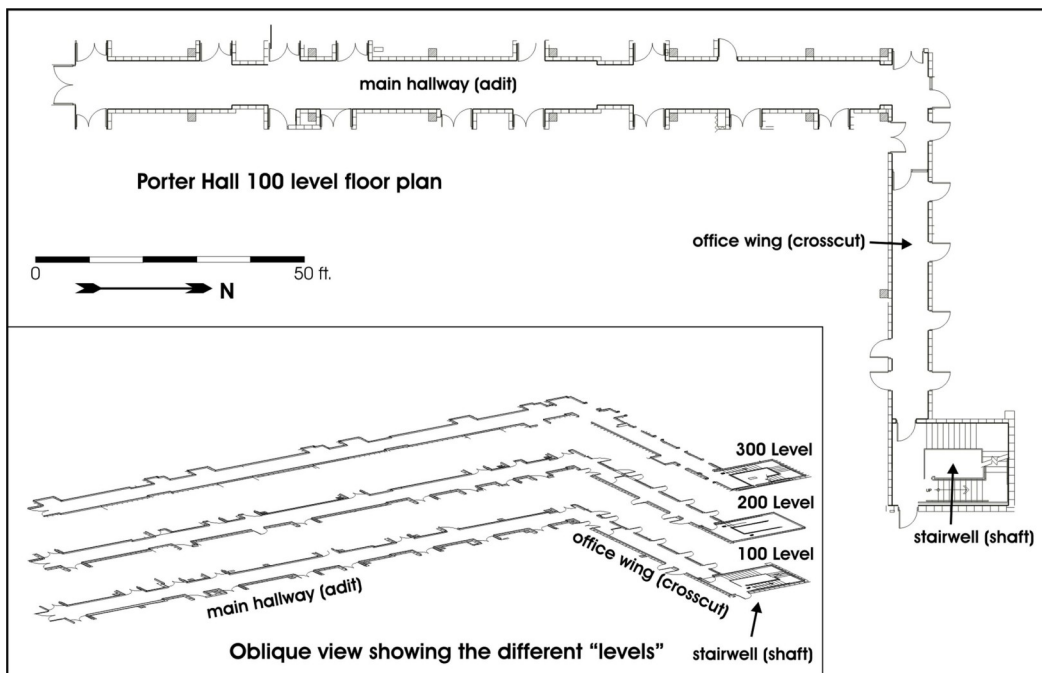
Simplified engineering drawing of the first floor of Porter Hall, showing the main hallway (adit), the office wing (crosscut) and stairwell (shaft) connecting to upper levels. The second and third floors of Porter Hall are similar in design. The main hallway is 150 ft. long, the office wing is 64 ft. long, and the stairwell is 20 ft. by 16 ft. The inset shows an oblique view of the three levels (1st, 2nd, and 3rd floors) of Porter Hall, drawn using Google Sketchup. View is to the northwest, floors are 14 ft. apart.
